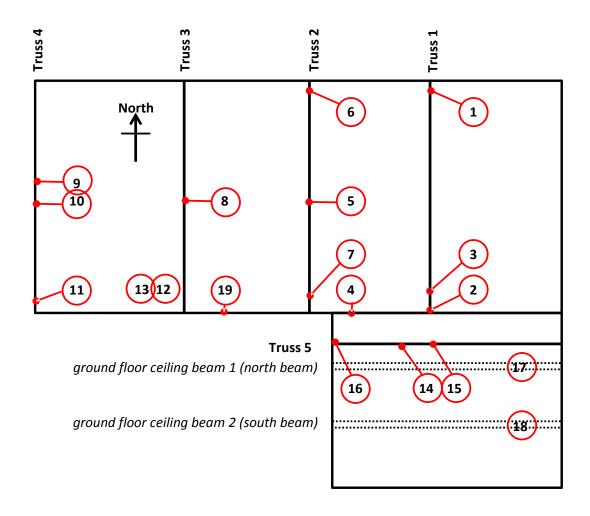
Simple schematic sketch plan to locate sampled timbers
